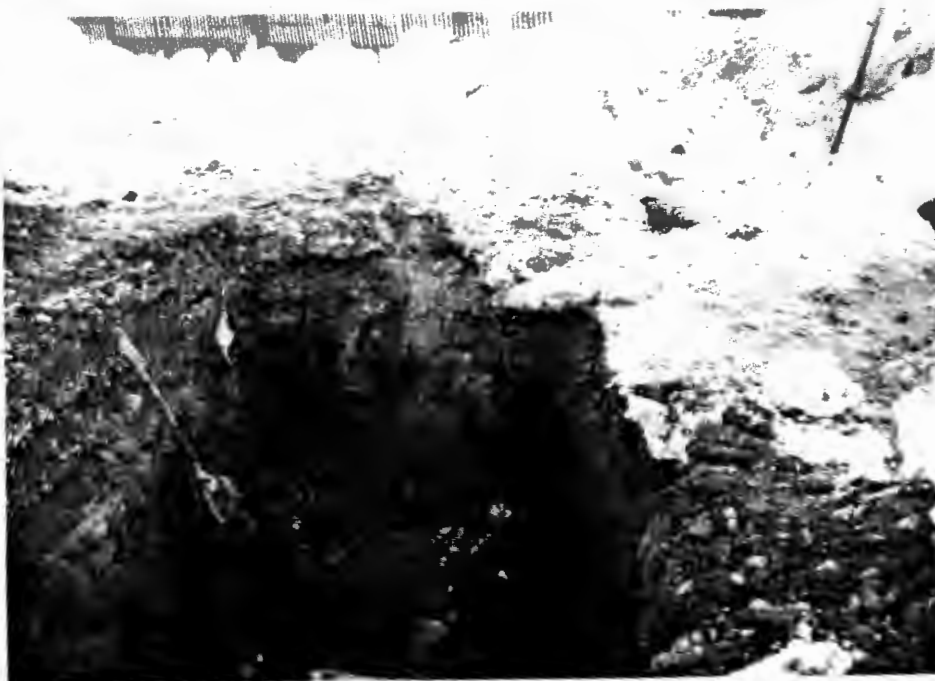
EXCAVATION OF SOIL FROM ATOP UST. (LOOKING WEST)
